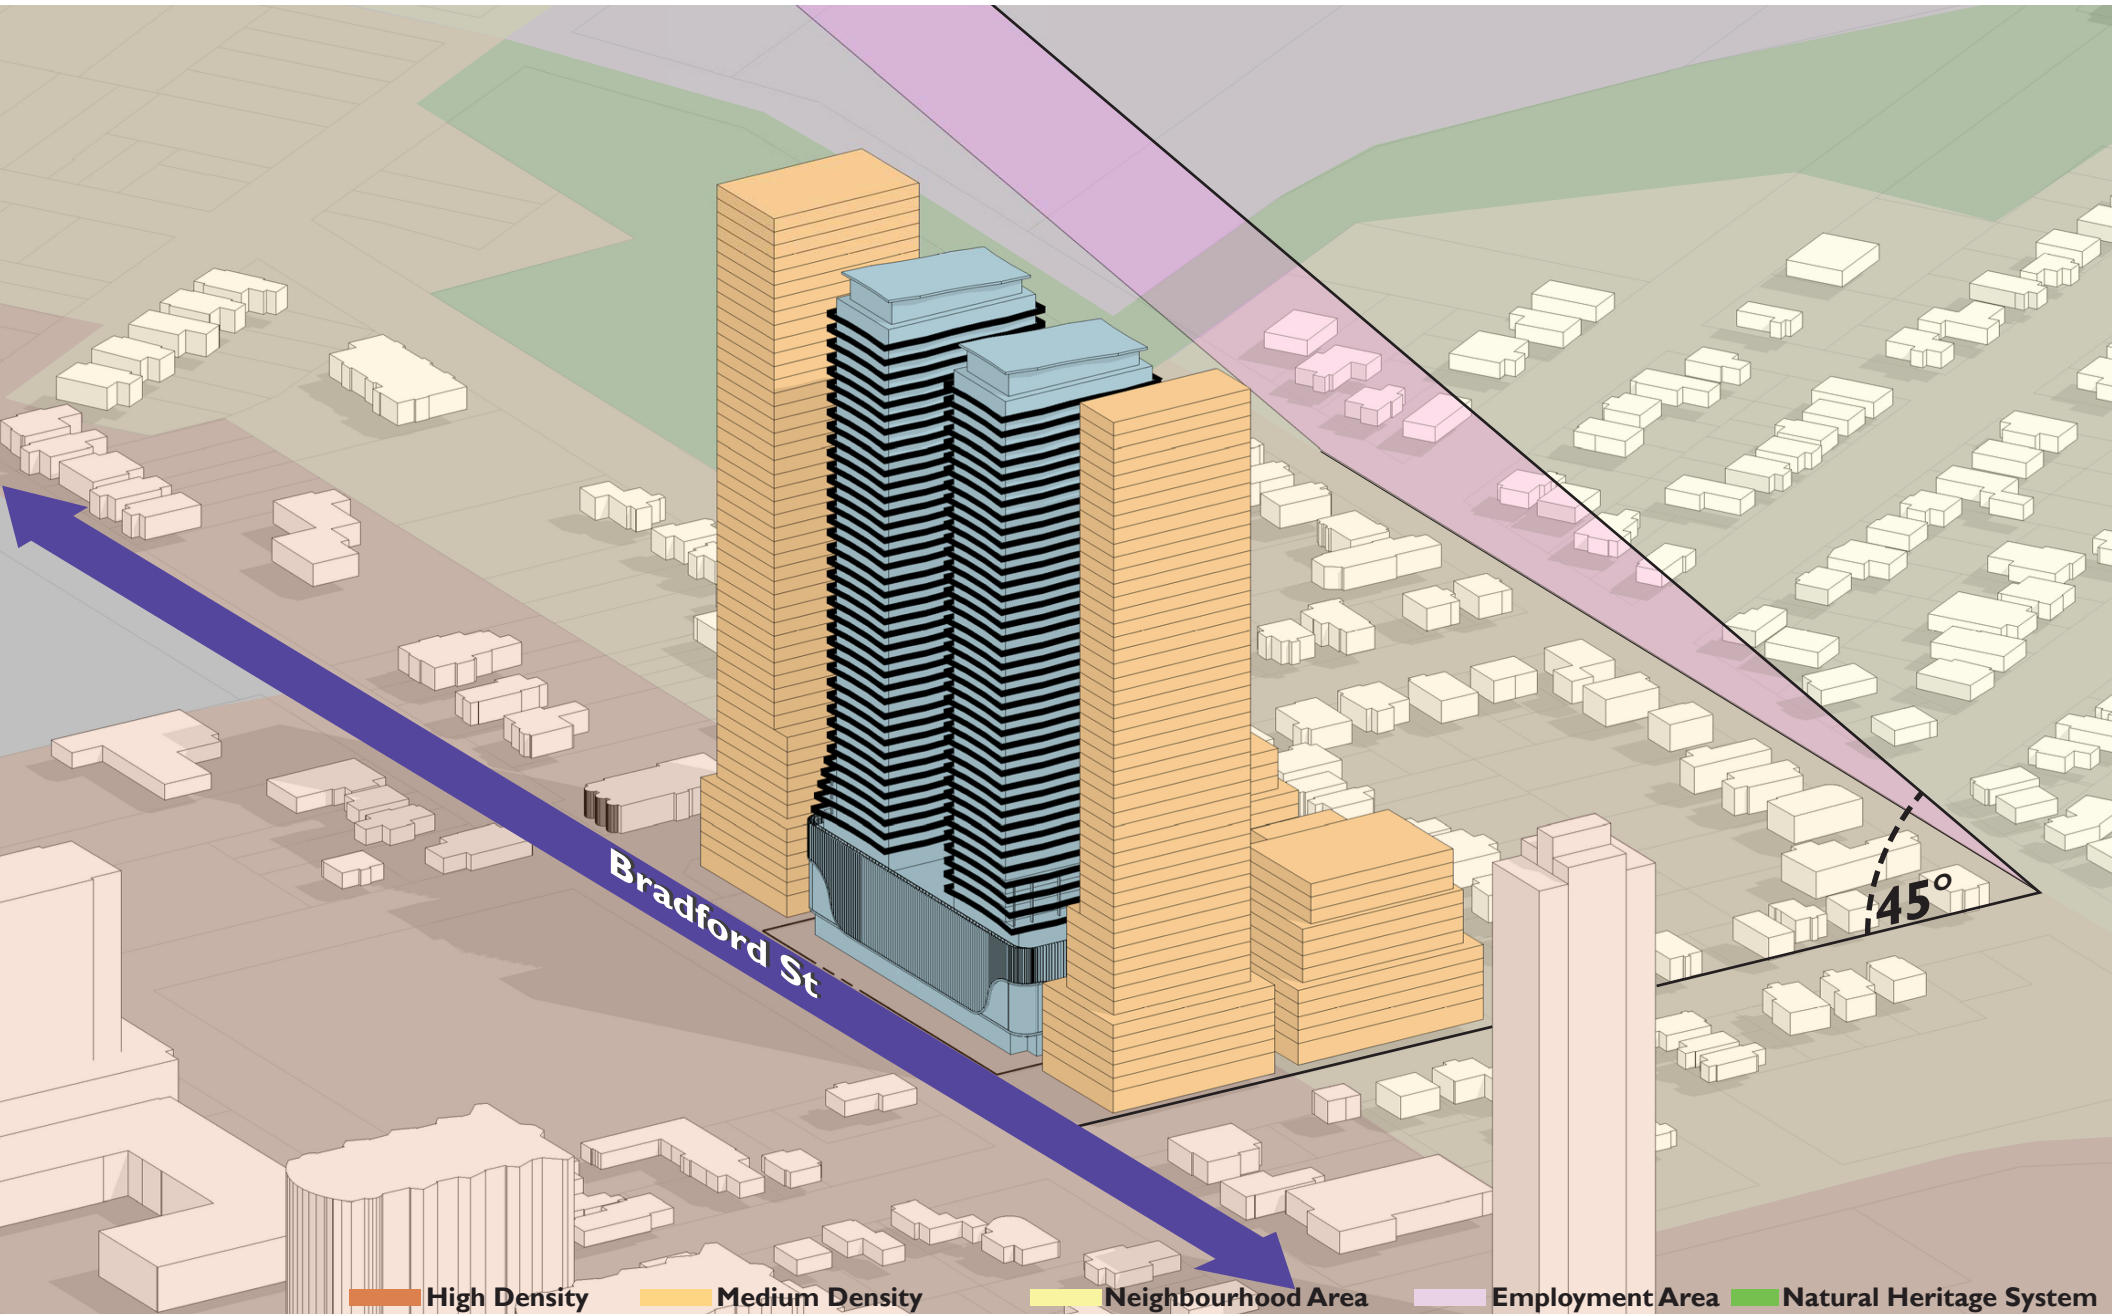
Block Plan - Neighbourhood Area Angular Plane
